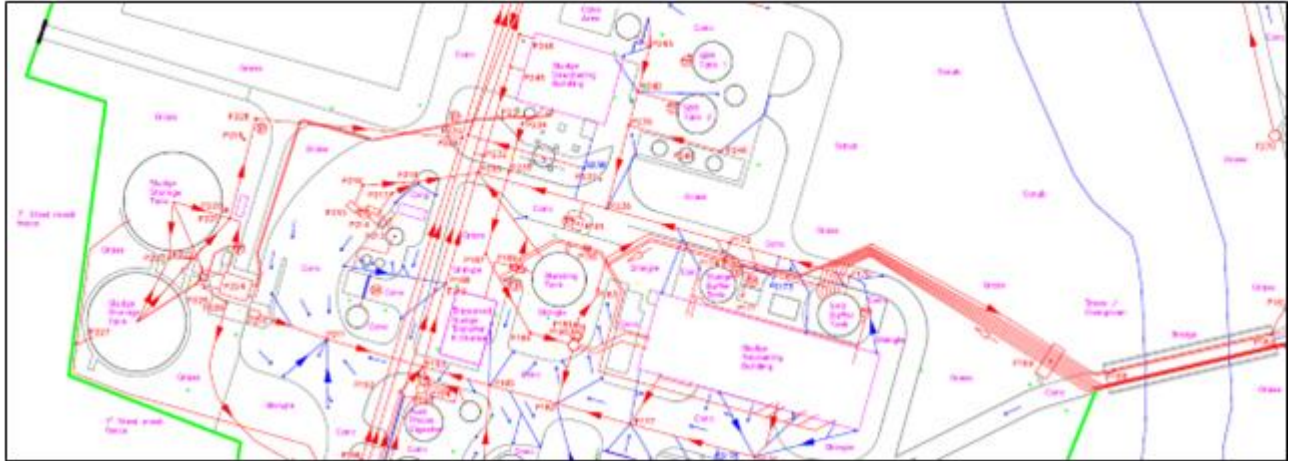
Bioresources Area surface water drainage – Plan 1 of 2
